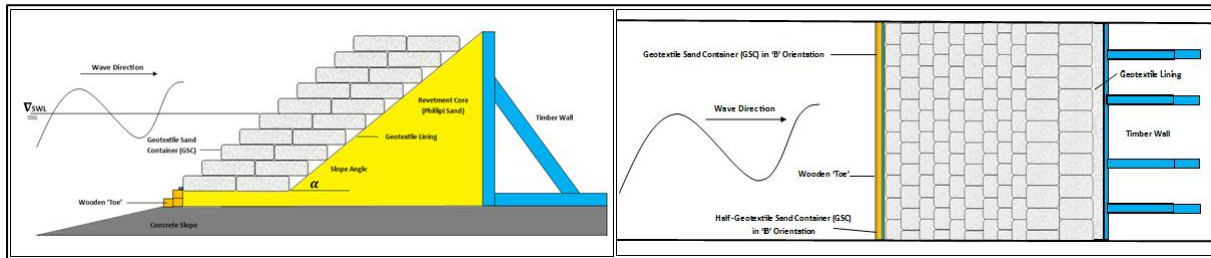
Schematic Cross-section (Left) and Plan View (Right) of GSC Revetment for Test Series 11
